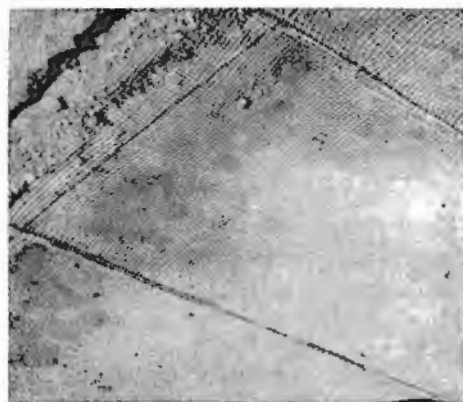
Wiremesh laid over flat roof using nails and 6 mm ϕ mild steel bars at 1 m center (both ways)
